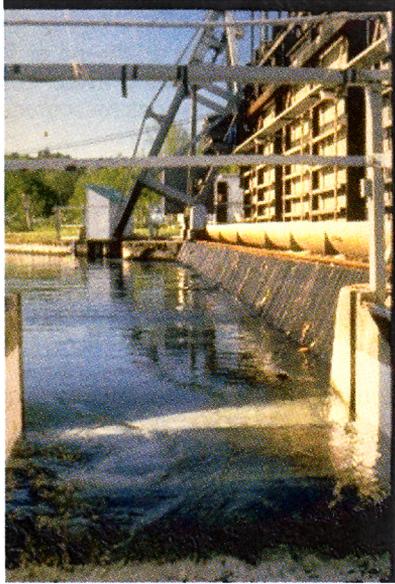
Downstream surface bypass at the Halsou power station intake (river Nive, Pyrenees).
